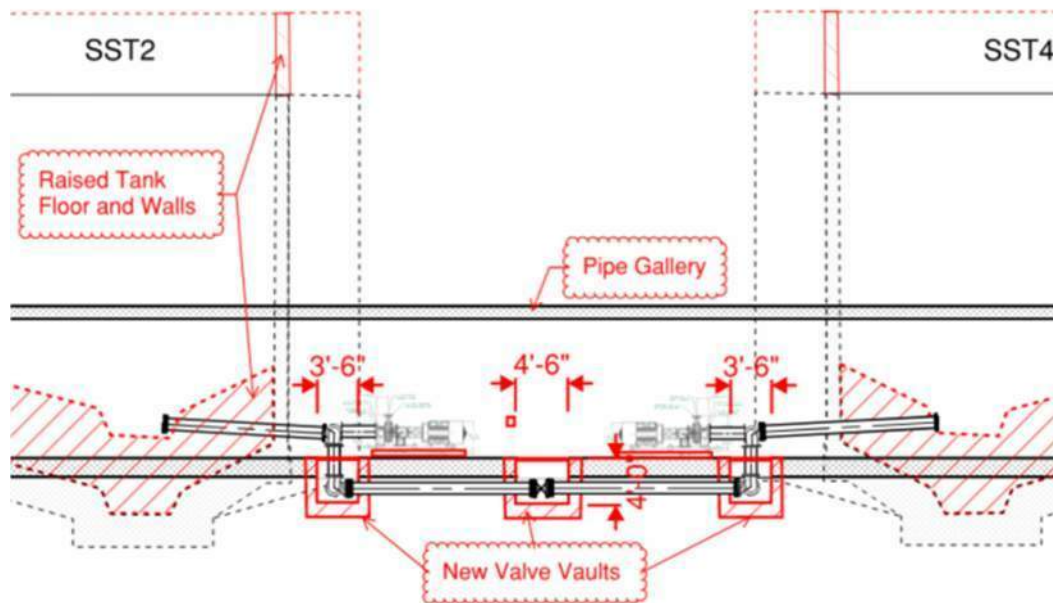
Alt-2A SSTs 1-4 Pipe Gallery Proposed Layout with Raised SSTs – Section View
